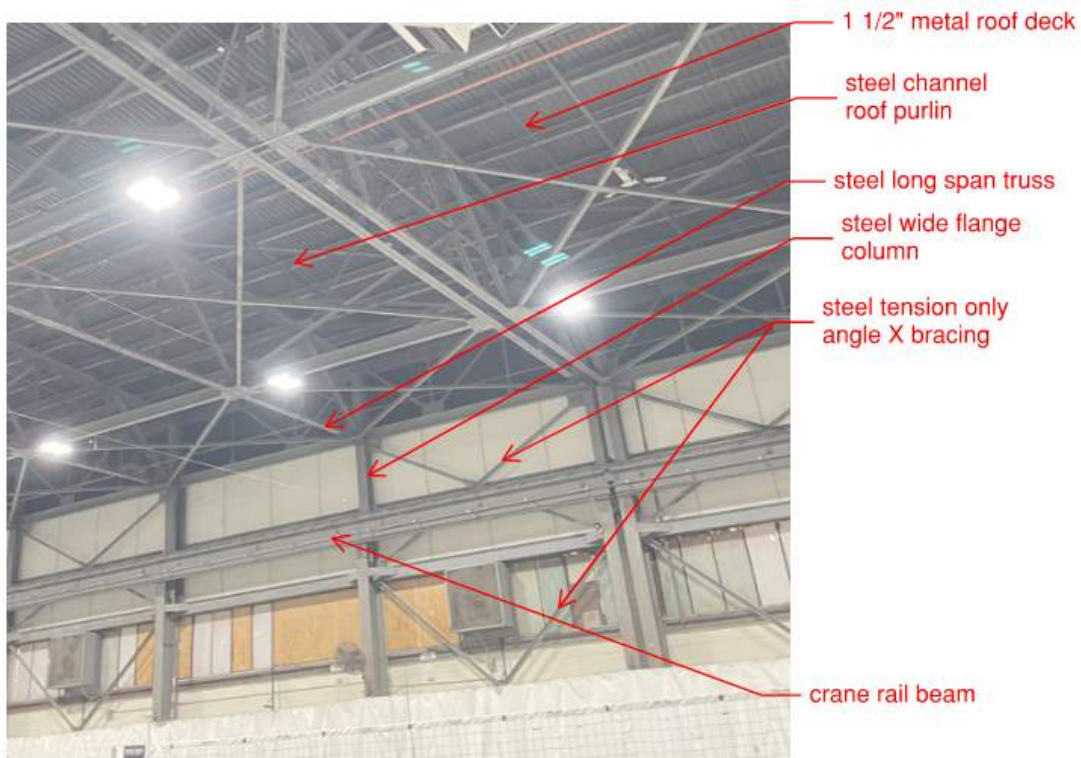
Typical Roof and Bracing Framing of Northern Building Section
